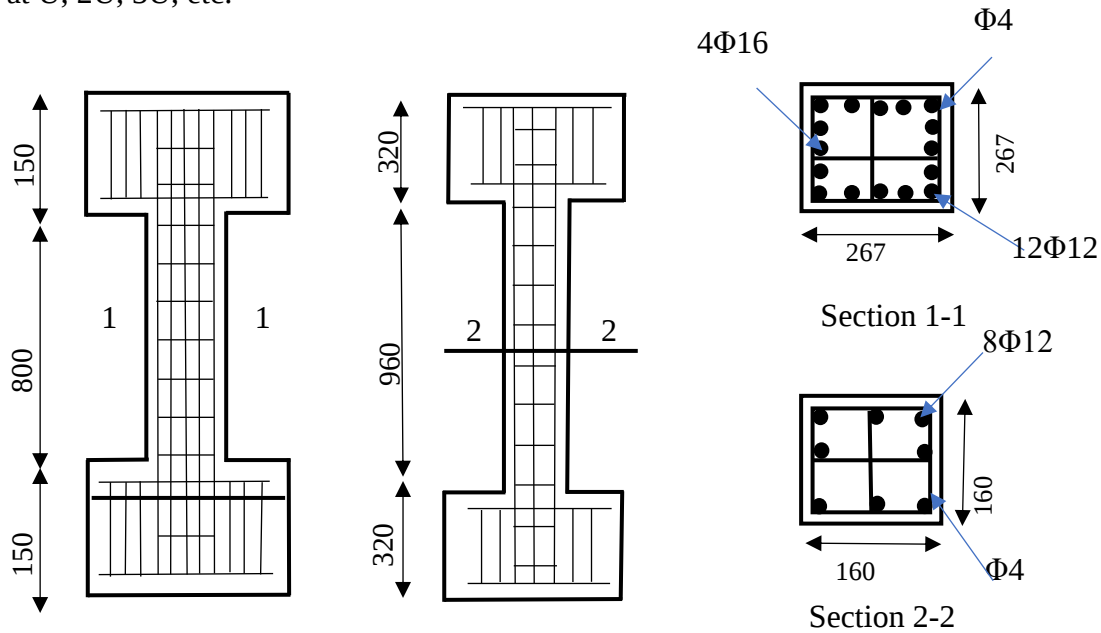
The Geometry and the Reinforcement Detailing of the Specimens Modified from Lam, Wu, Wong, Wang, Liu and Li (2003)
